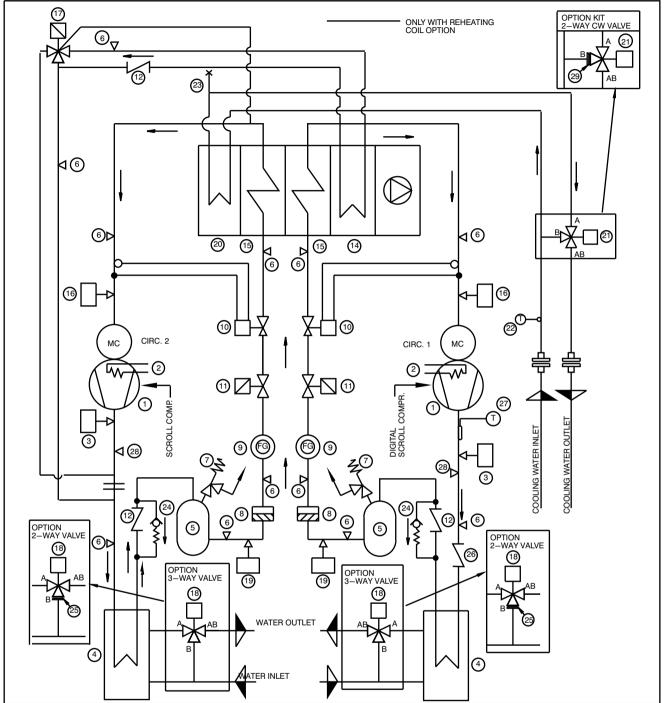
Refrigerant circuit H version - Dual circuits - Single SCROLL compressors - EEV
